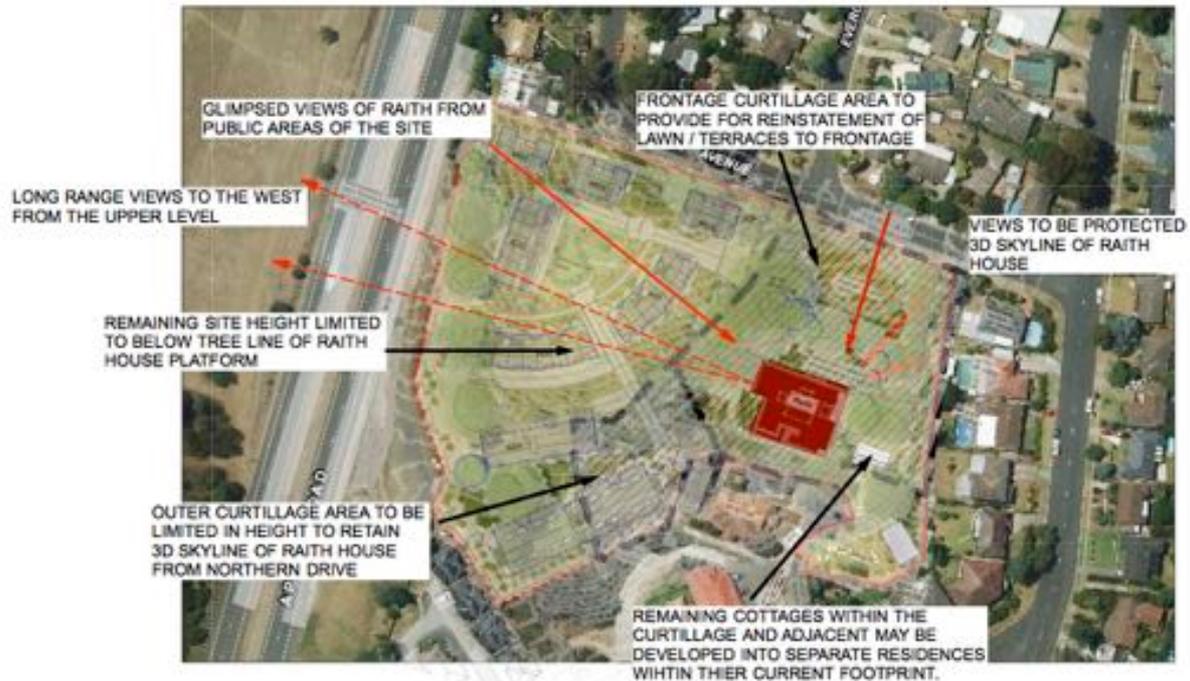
Proposed Curtilage – with overlay of new proposed layout for medium density development.
